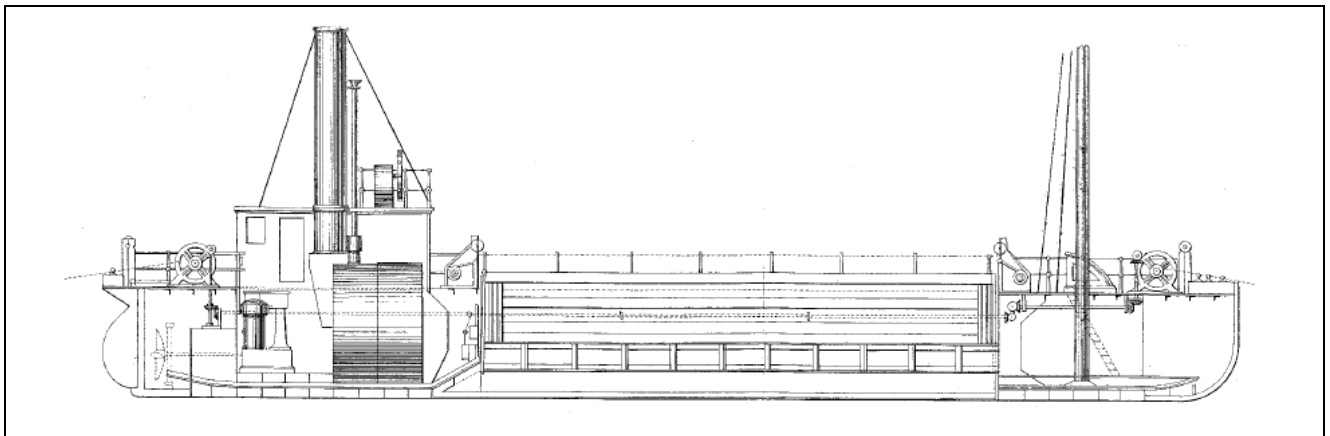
Bottom-dumping barge for concrete-filled bags
